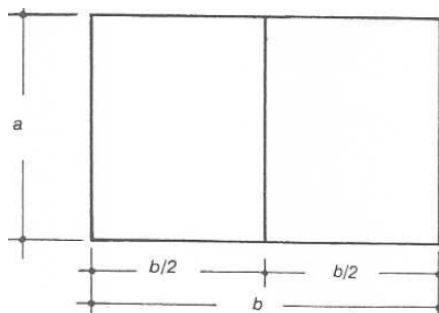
General geometric plan features of the double-containment tanks considered for the study.
